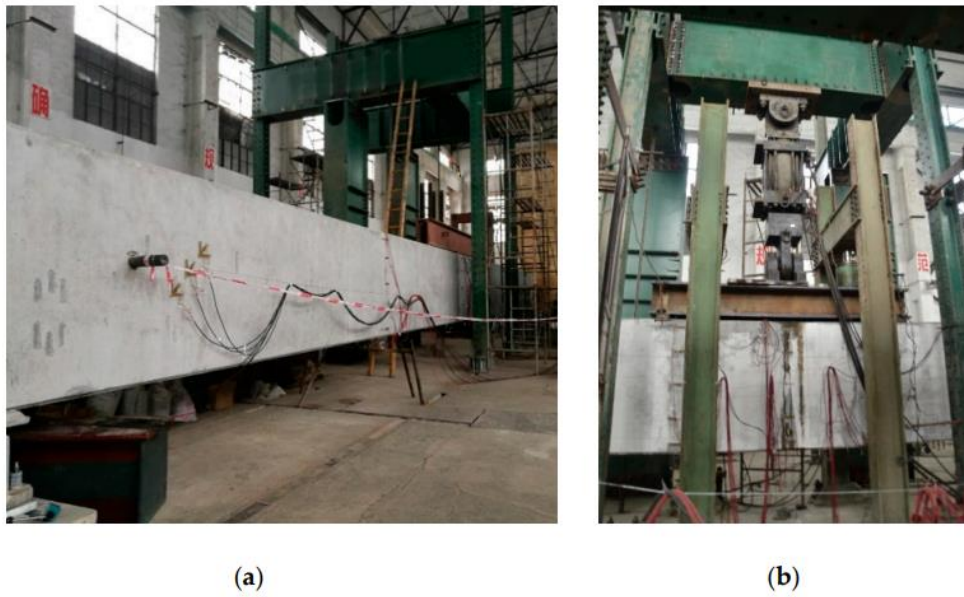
Loading setup (a) specimen and device and (b) detail of testing system actuator [22]
